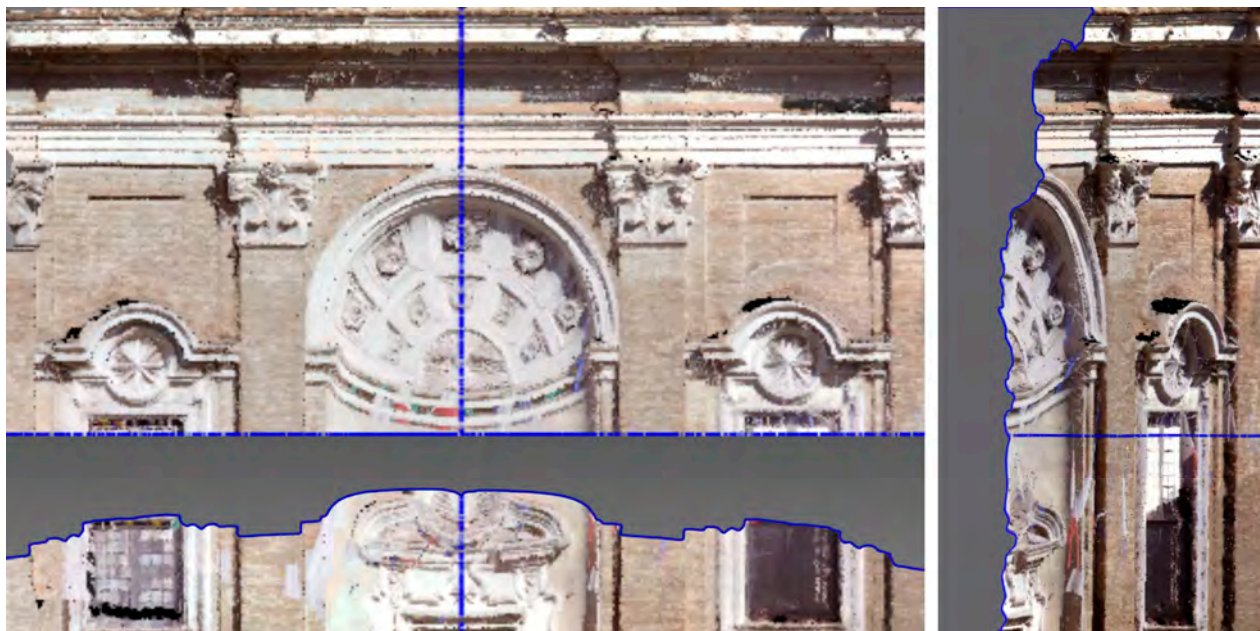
Elevation, plan, and section after the photographic model (elaboration of the author). In blue, the vertical and horizontal sections (image by M. Carpiceci).
